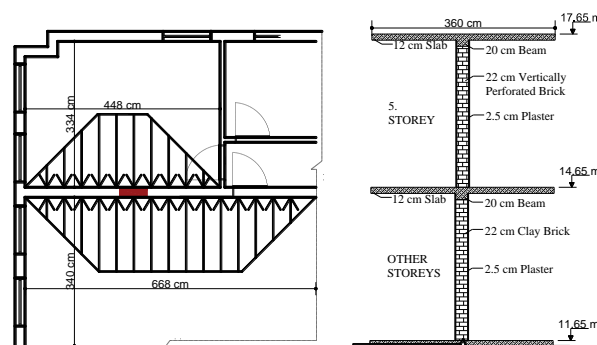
Load distribution acting on the wall and the specimen and the vertical section of the wall
